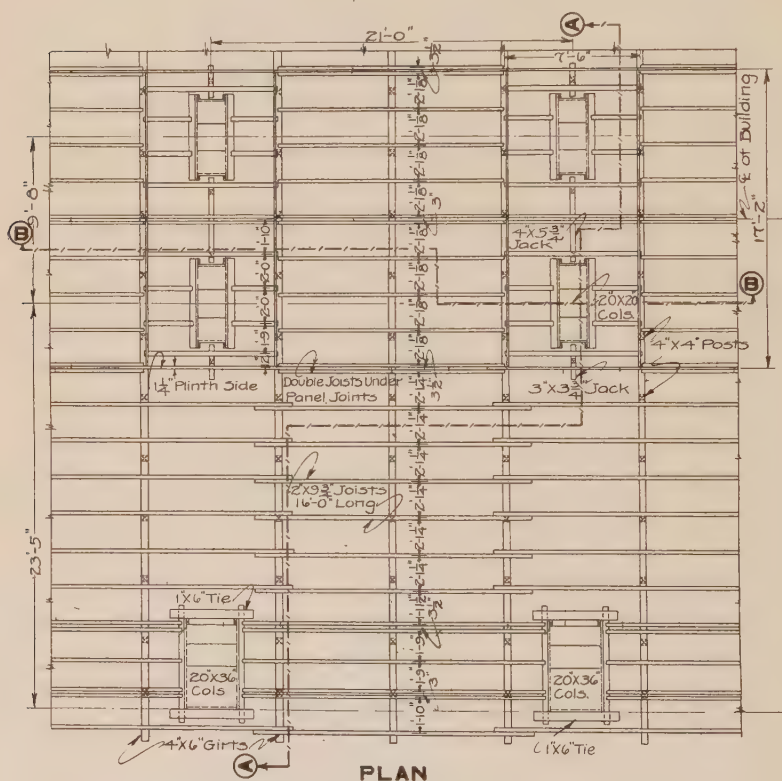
A.—TYPICAL ASSEMBLY OF FLOOR CENTERING.
